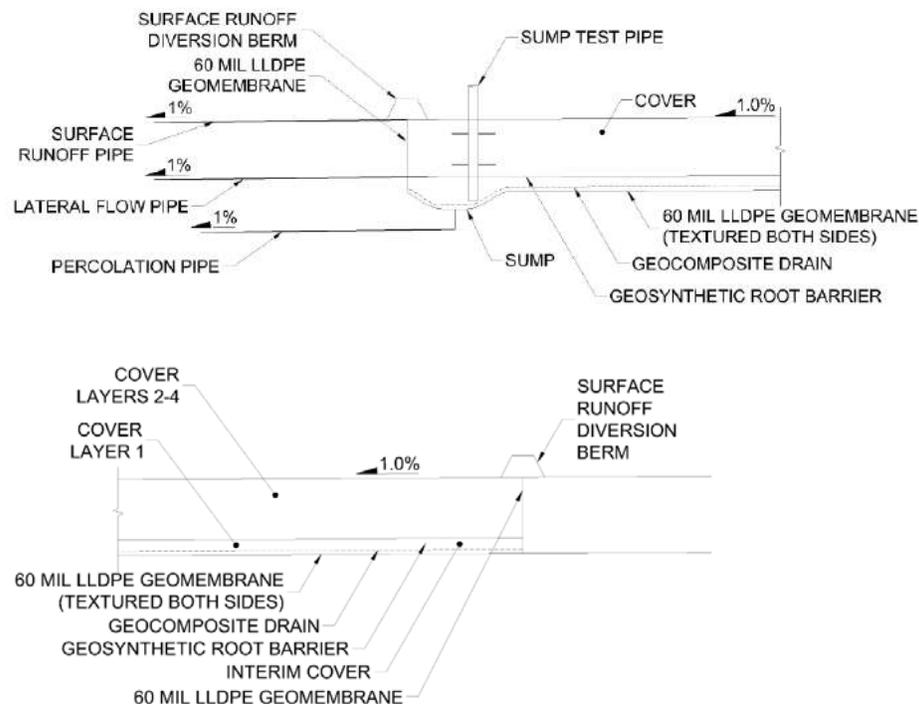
Cross sections for downslope (upper) and upslope (lower) ends of lysimeter.
